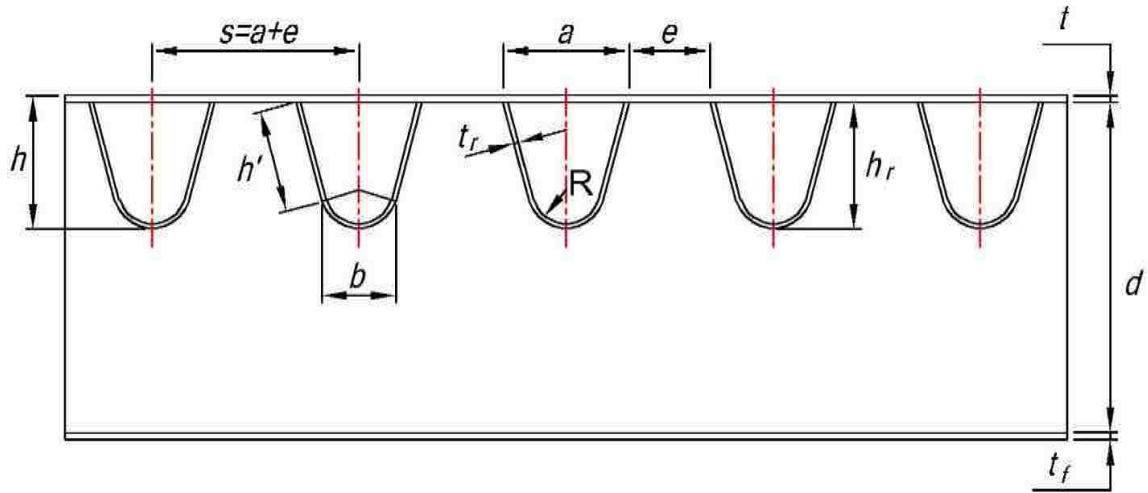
Parameters of a steel orthotropic bridge deck with rounded bottom rib profile
